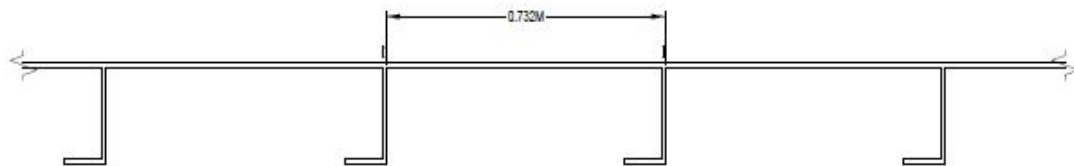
Longitudinal Section of Typical Stiffened Pontoon Deck
